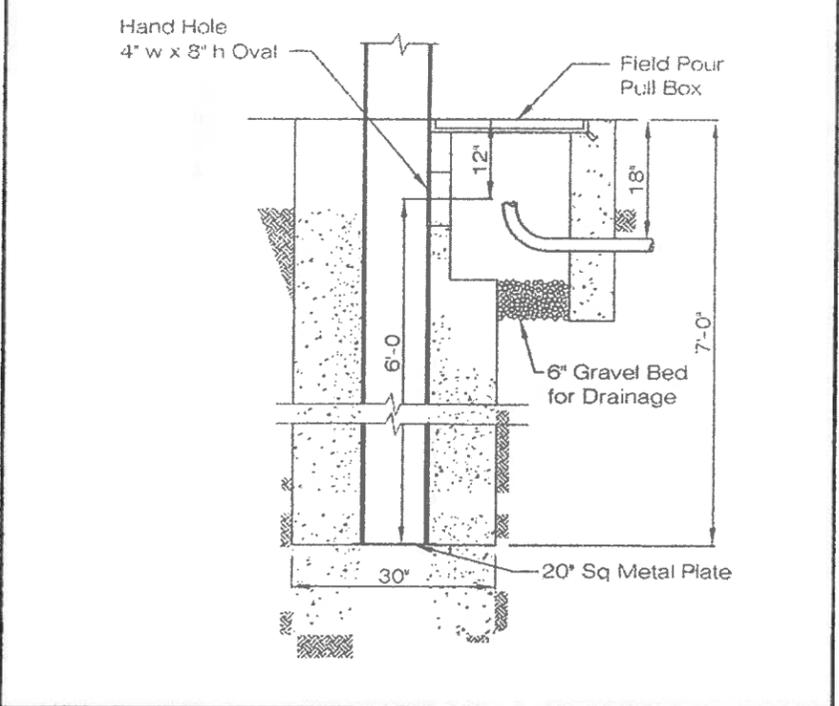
CONCRETE FOUNDATION FOR ANCHOR BASE STEEL POLE
